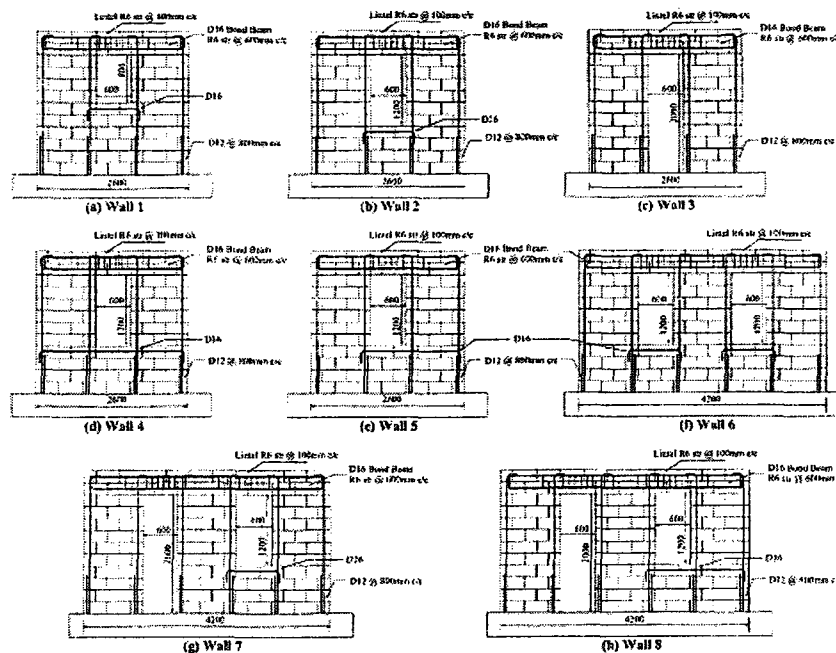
Reinforcing details and dimensions of tested walls with reinforced concrete masonry lintels (Voon and Ingham, 2005)
